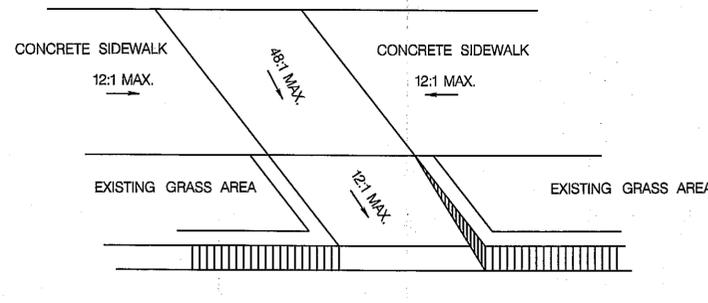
DETAIL B: NEW CURB AND GUTTER PLACEMENT (OPTION 2)
